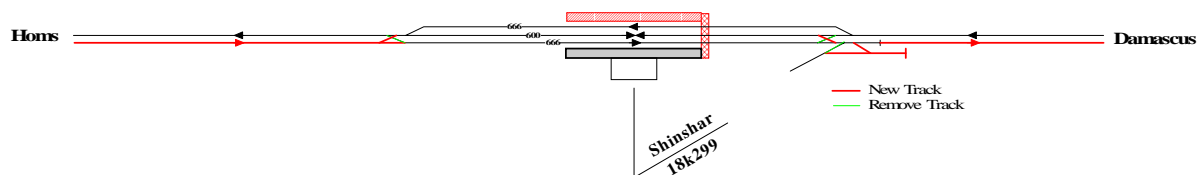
Sketch of Shinshar station improvement track layout
